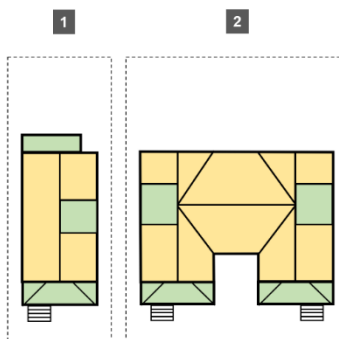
Primary Roof Structure & Secondary Roof Structures (Plan View)
